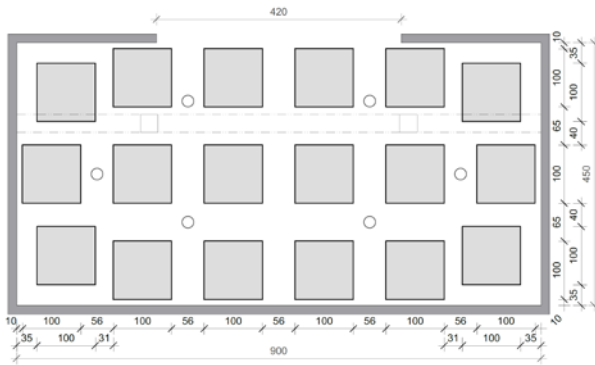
Floor plan with arrangement of the 18 wooden cribs and the six thermocouple trees (circle) for test V4 [in cm]
